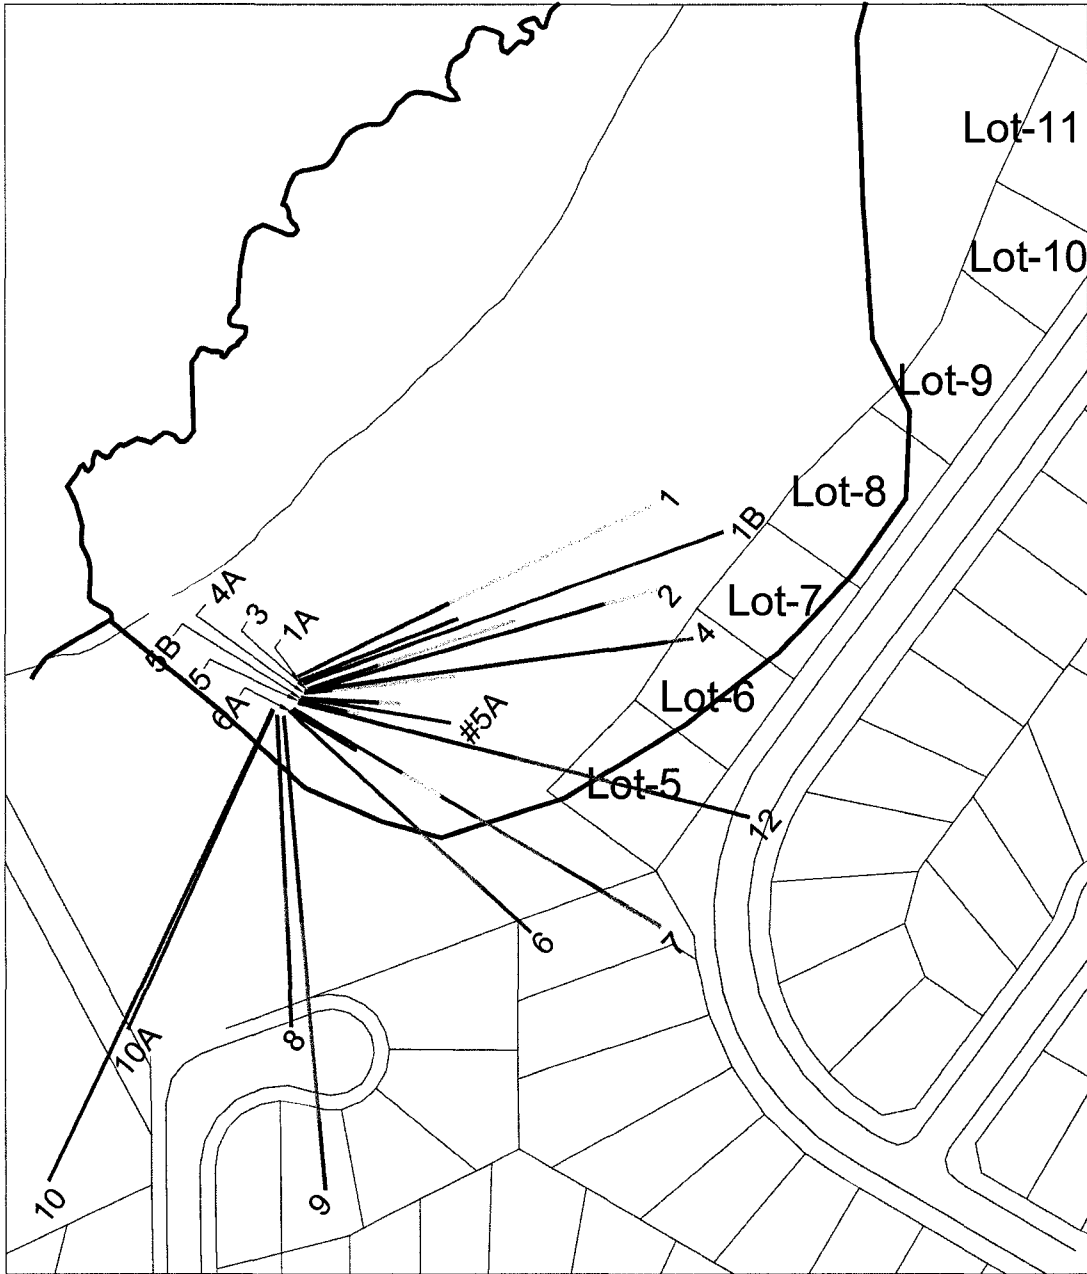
Plan view of drain installation in the Whitemud Road slide area
